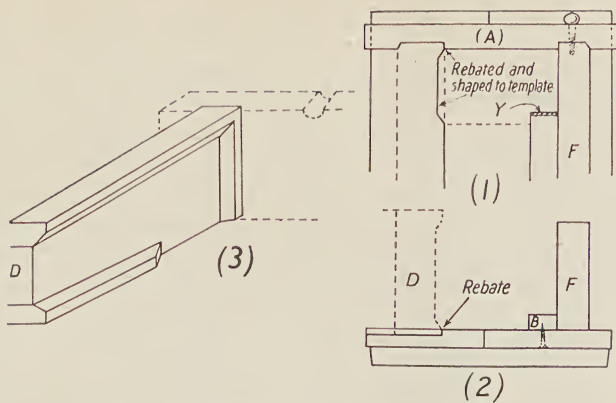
MOULD FOR TOP OF DOOR FRAME.
